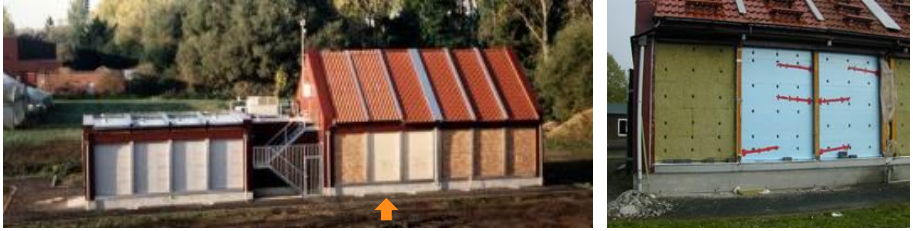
(left) Picture of the north-east façade of the Vliet test building in 1996. The considered test wall is located in the south-west façade, but is similar to the wall indicated in the picture by the orange arrow. (right) Picture of the construction of some of the walls in the south-west façade before the installation of the outer brick leaf.
